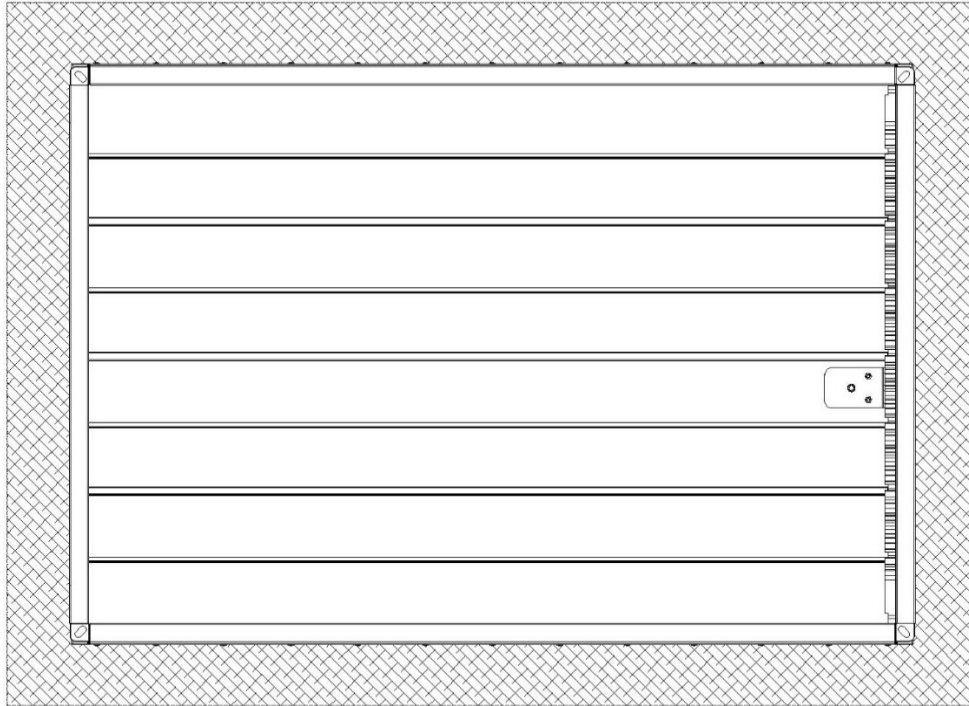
Installation method of fire dampers WKP-P in flexible wall
